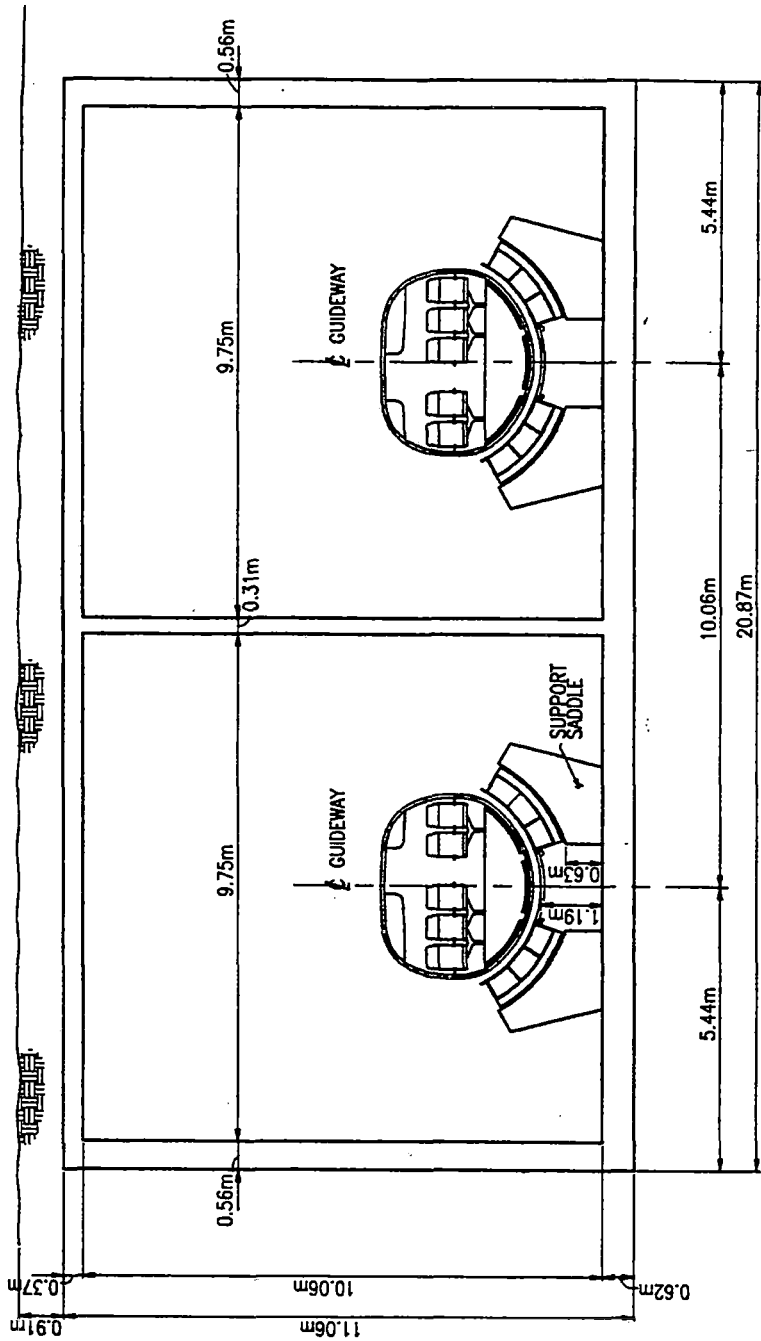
Cut and fill tunnel - 10 x 9.8 m
